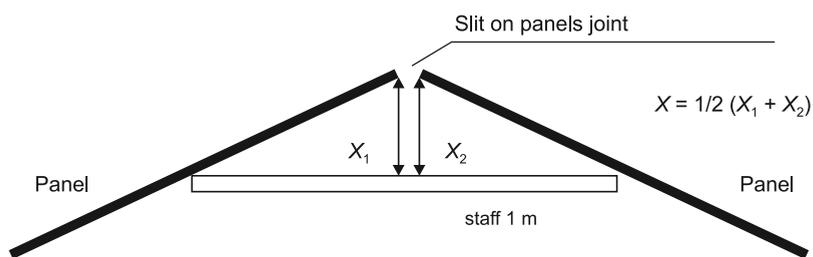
Manner for determination of angle between panels through measurement of distance (X) from 1 m staff
